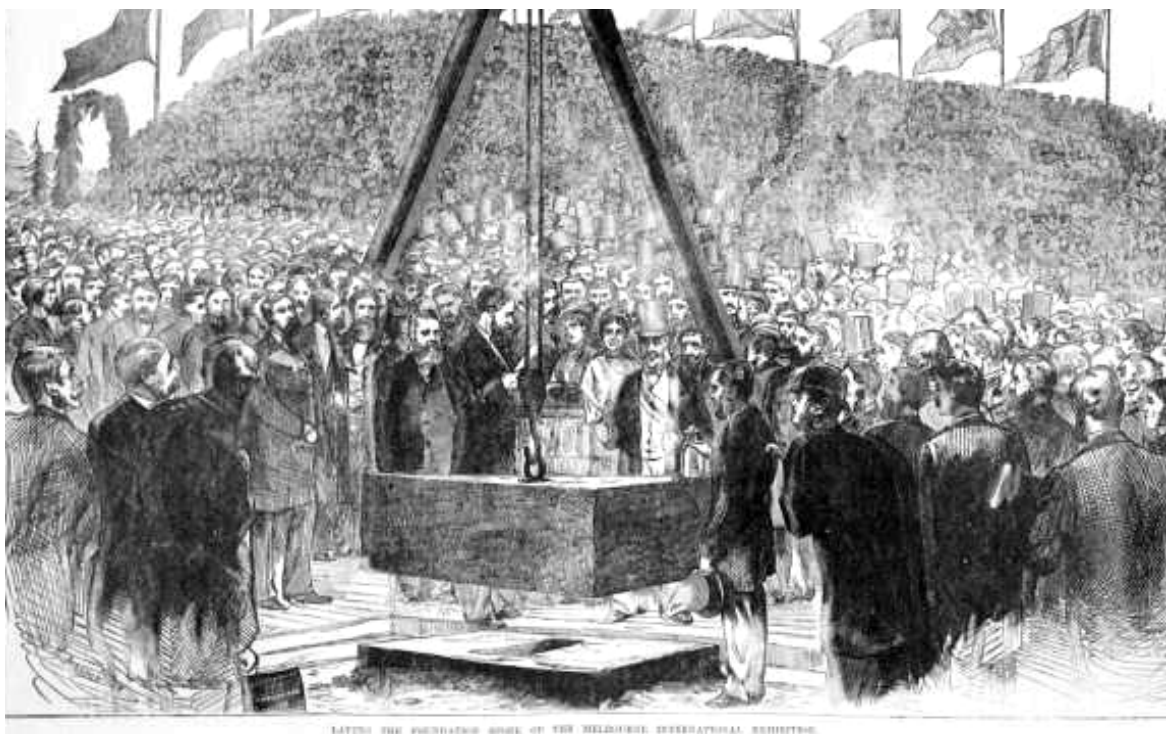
Sir George Bowen laying the foundation stone of the Melbourne International Exhibition Building, 1879.
